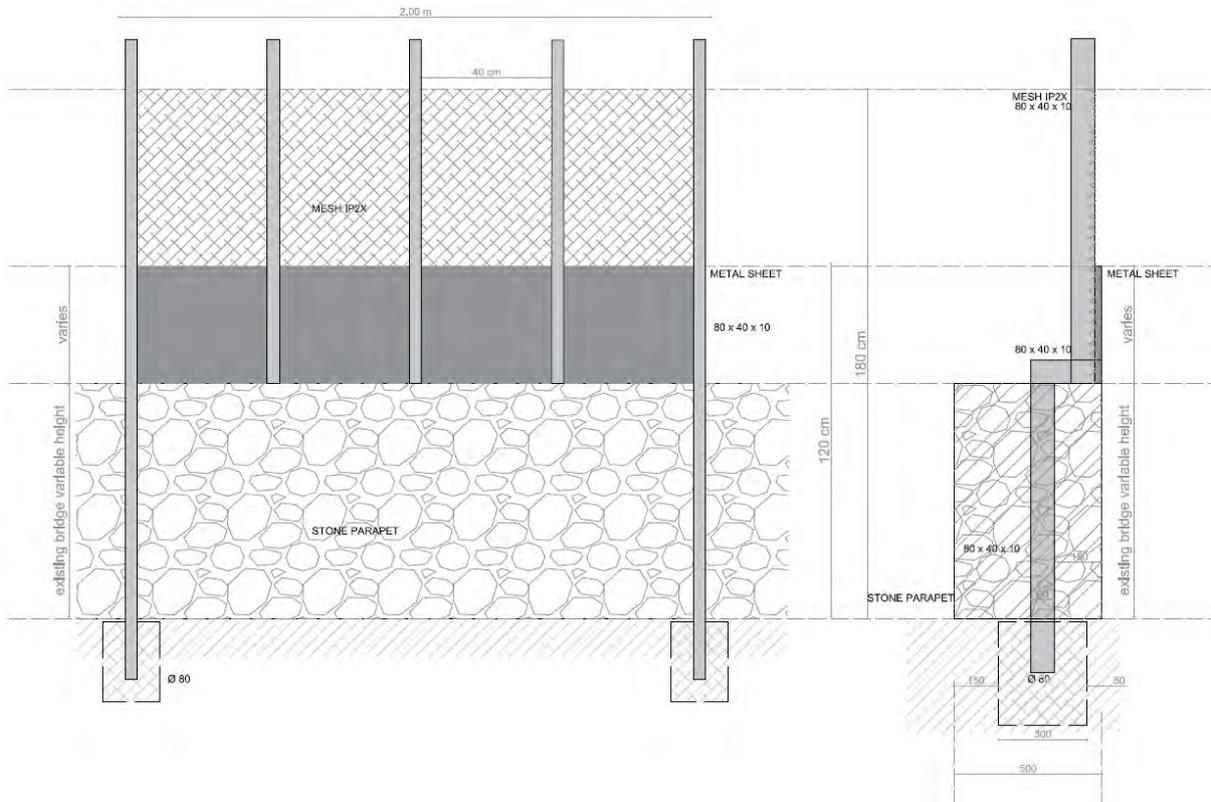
Alternative parapet heightening solution for bridges with width restrictions
